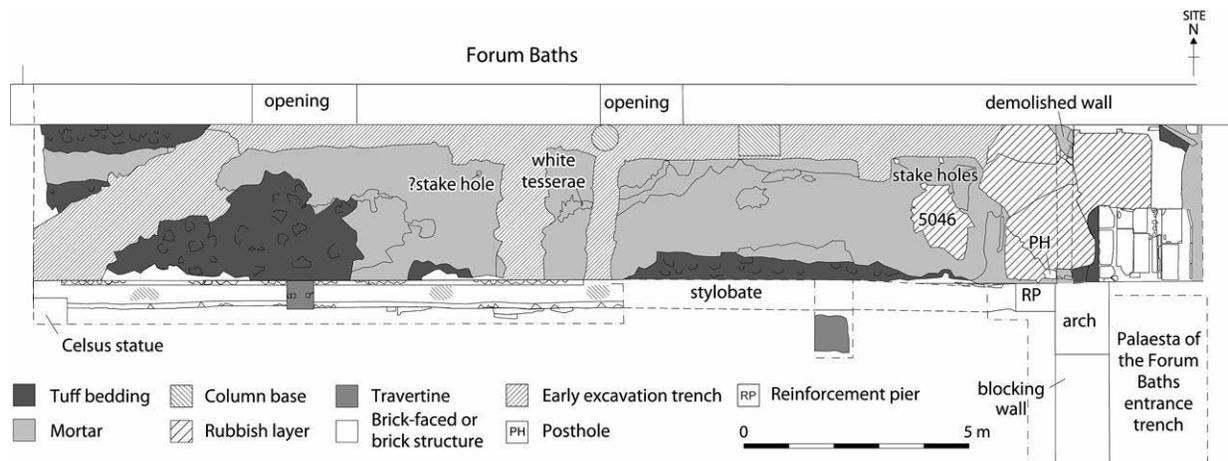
Preexcavation plan of Main Forum Sidewalk trench (drawing by E. Boast, E. Luby, J. Measor, C. Murphy, and R. Manahai-Mahai).
